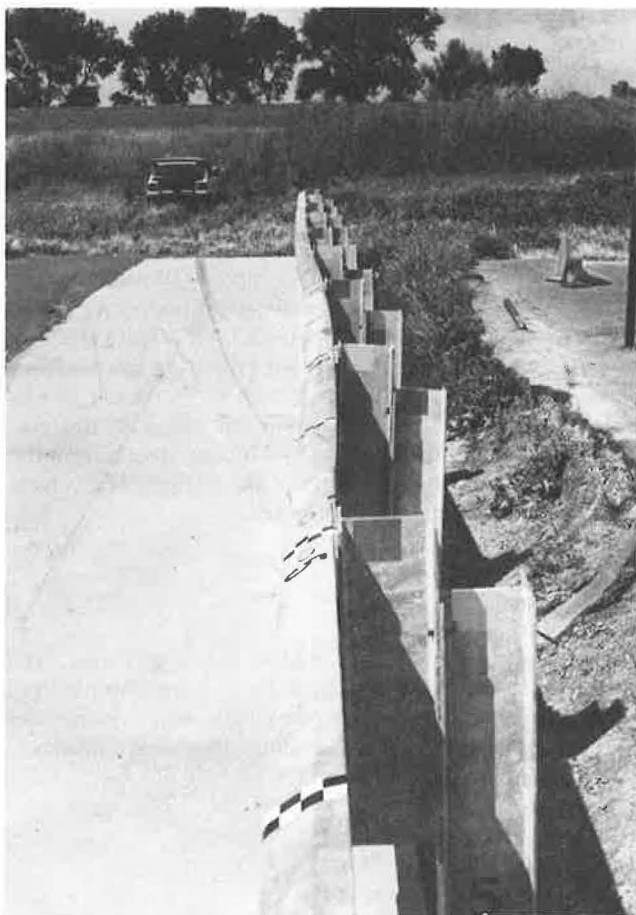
Rail damage: bent rail, bent posts, Test 474.
